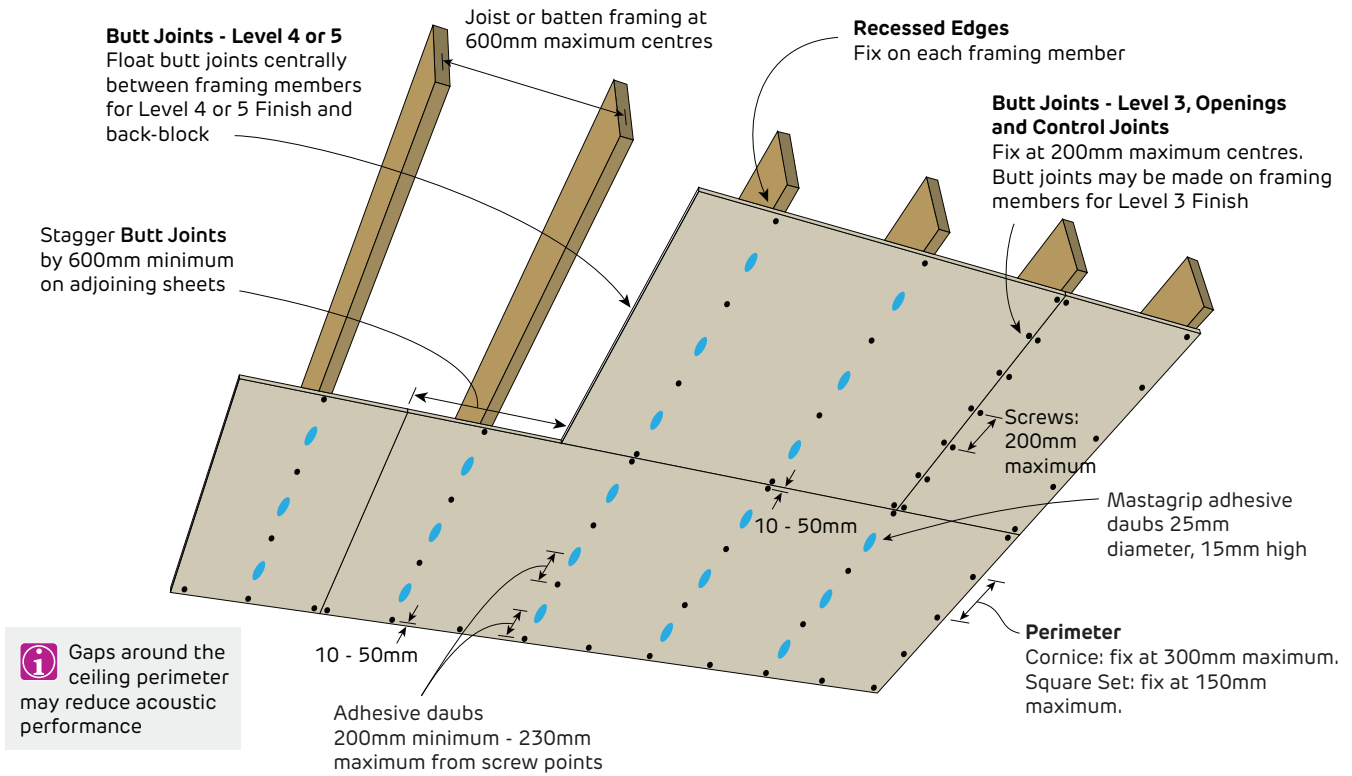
Plasterboard Ceiling Perimeter Detail
